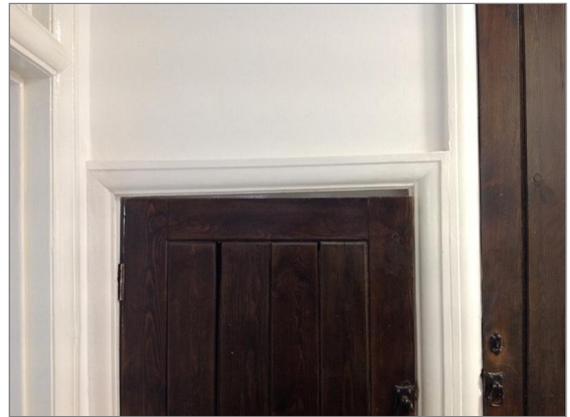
Movement in floor structure shows up in misalignment of door frame
